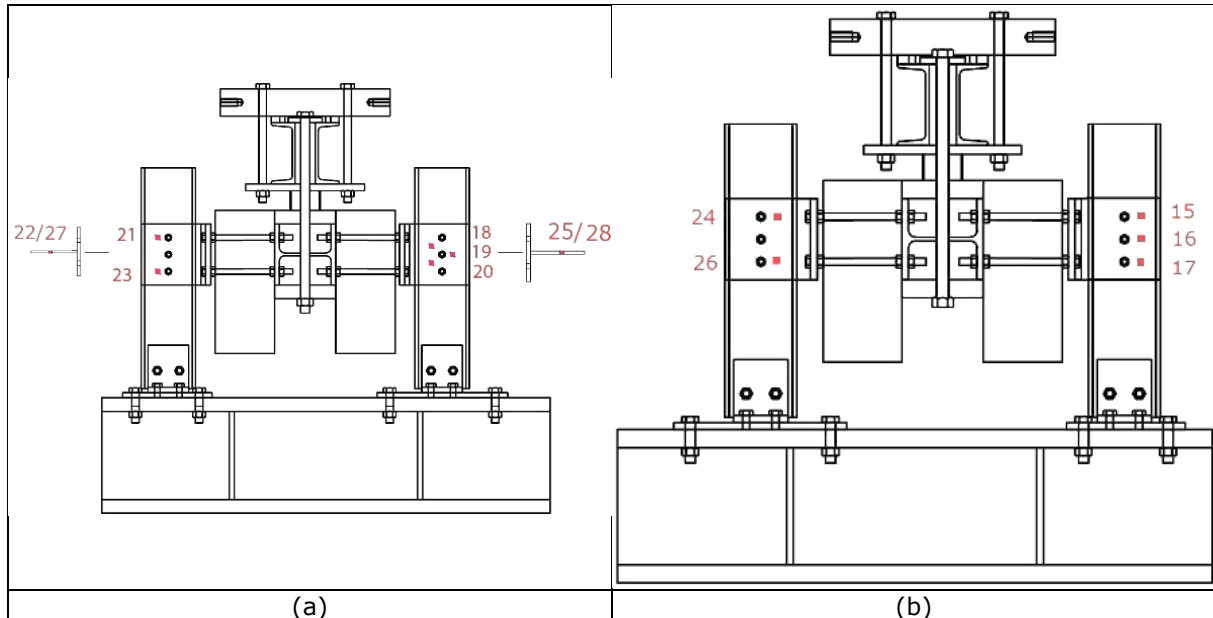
Detail 4 - strain gauges position: (a) on front side; (b) on back side.
